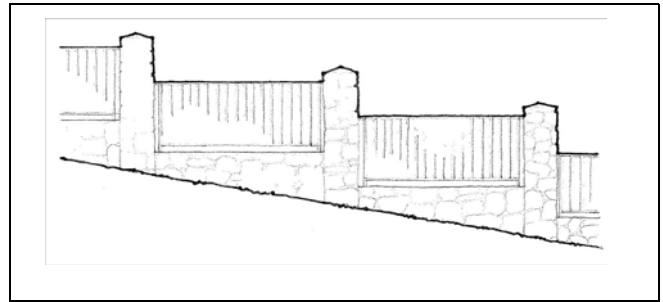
An alternative design for the Residential 2 zone, that uses stone pillars, which can be used on sloping ground.
